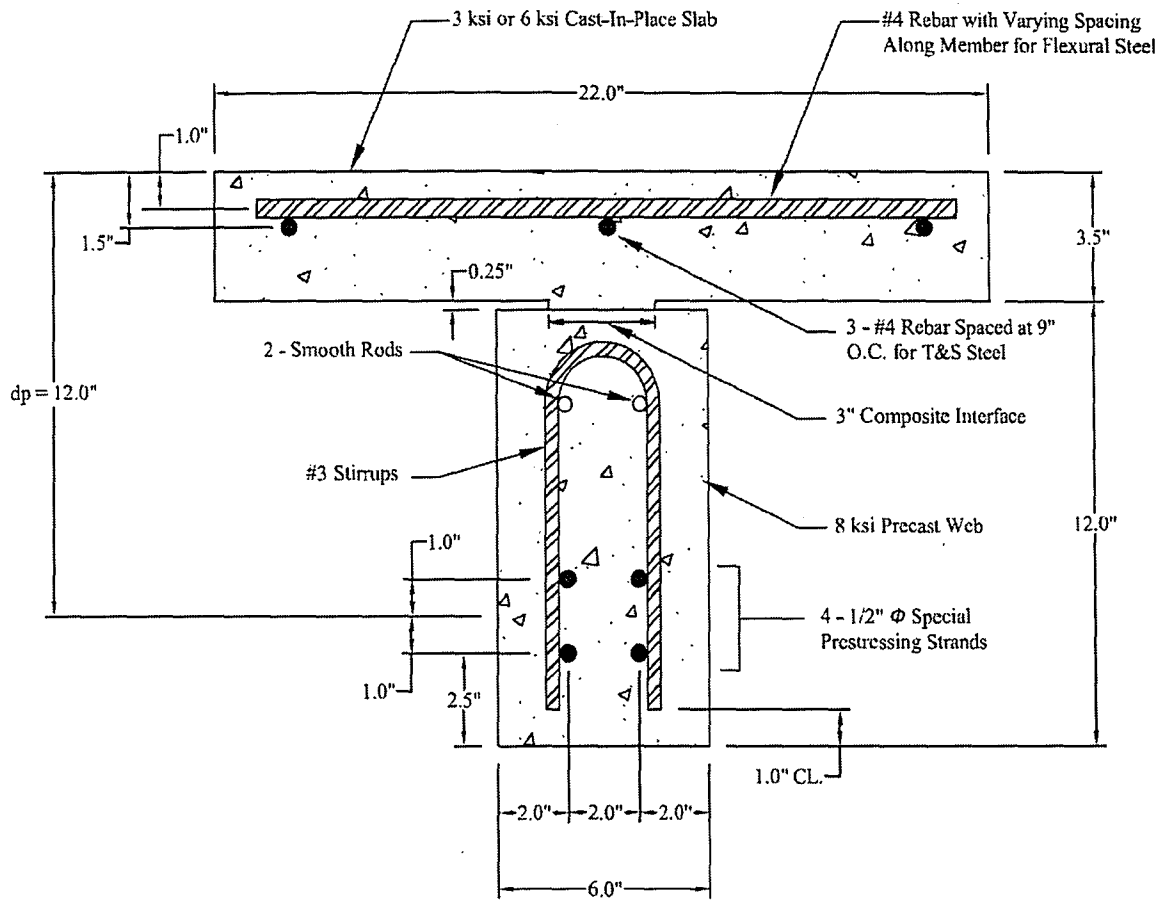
Cross-Section View of Phase 2 Test Specimen
